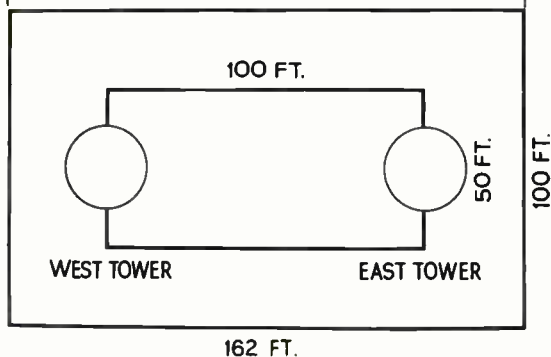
Plan dimensions of top of John Hancock Center facility building and antenna towers.
